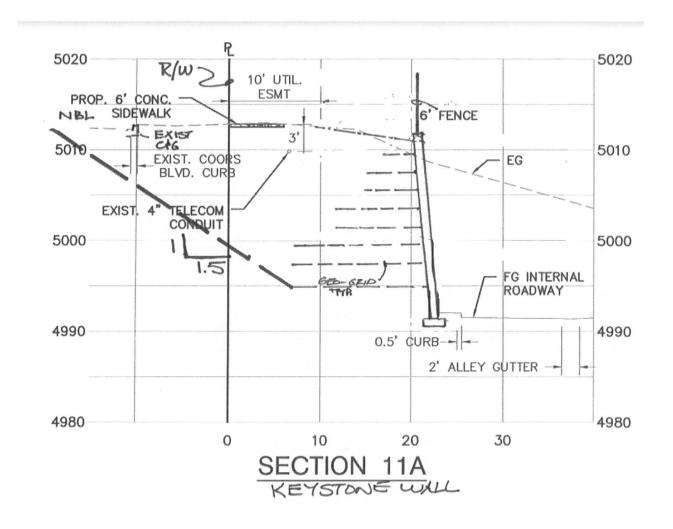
Exhibit B: Section study Mechanically Stabilized Earth (MSE) retaining wall (Keystone)
